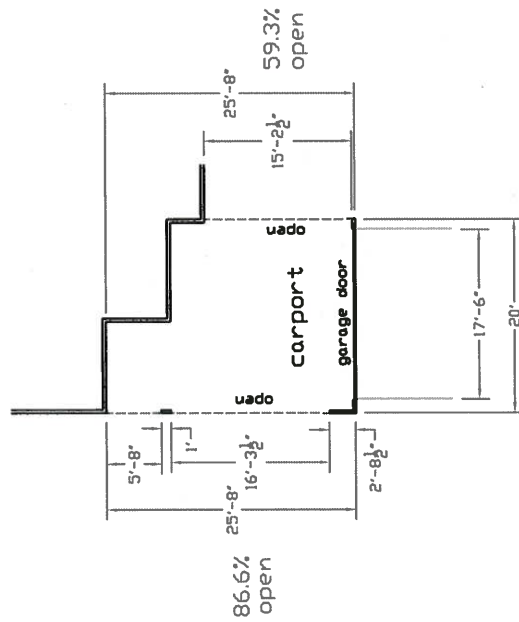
Exhibit B illustrates possible examples of parking areas that are adjacent to covered and enclosed entry ways. ZNA believes that Examples 1 through 6 are instances where the carport opening is not clear and unobstructed. We believe Examples 7 and 8 are acceptable under the current wording of the ordinance.
